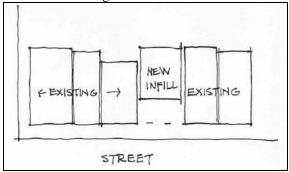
Inappropriate Alignment - new infill building has been set back from established "streetwall"
